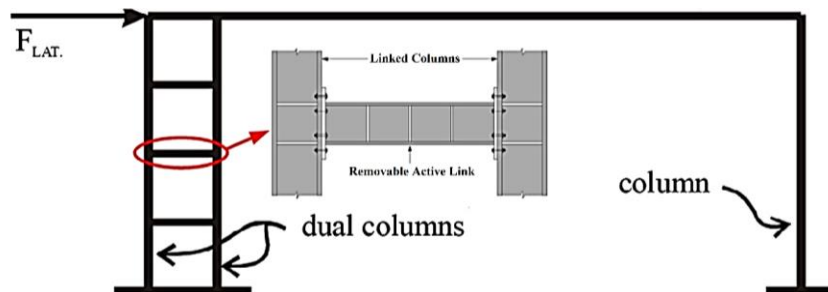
Concrete or steel frame retrofitted with the LCF system (Lia et al., 2018)
